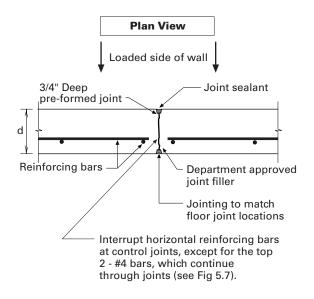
Wall sawn or formed control joint with joint filler (dry joint).
